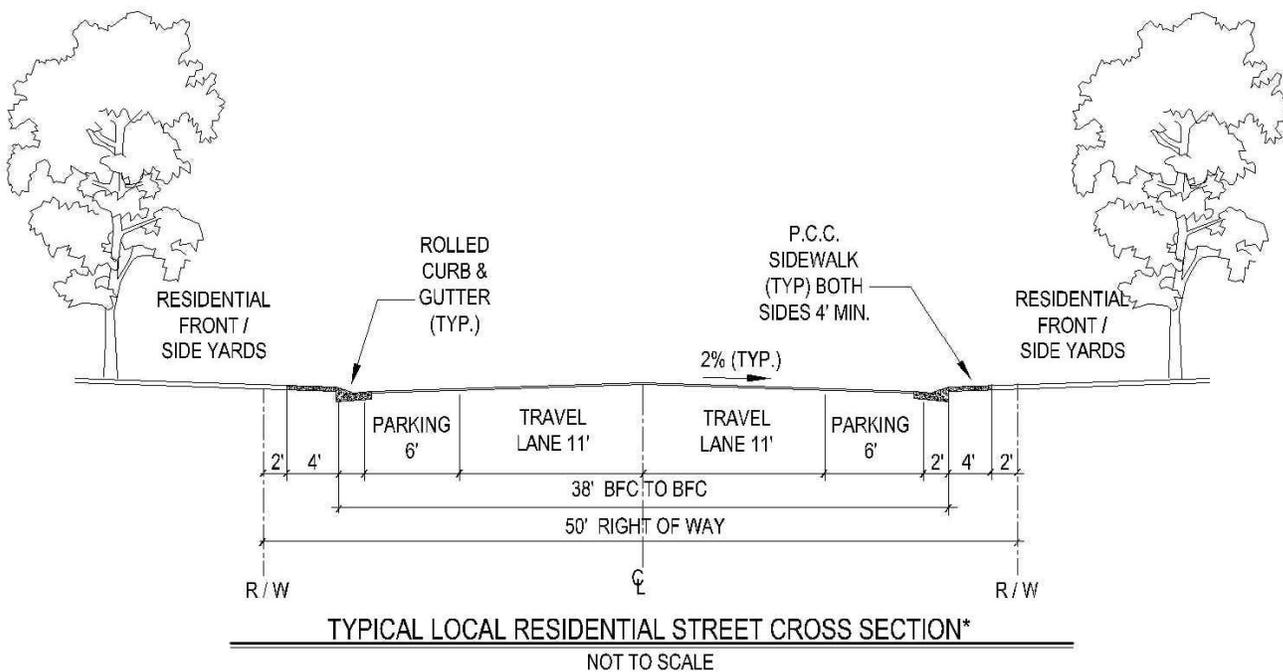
Typical Local Residential Street Cross Section (LID Alternative)
